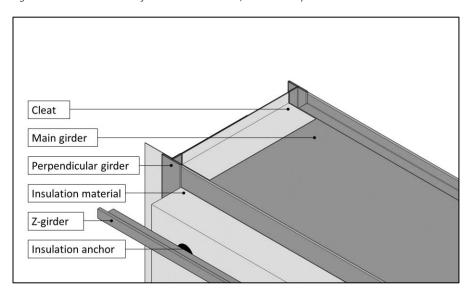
Isometric view of element zoomed in on connection between main- and perpendicular girder
